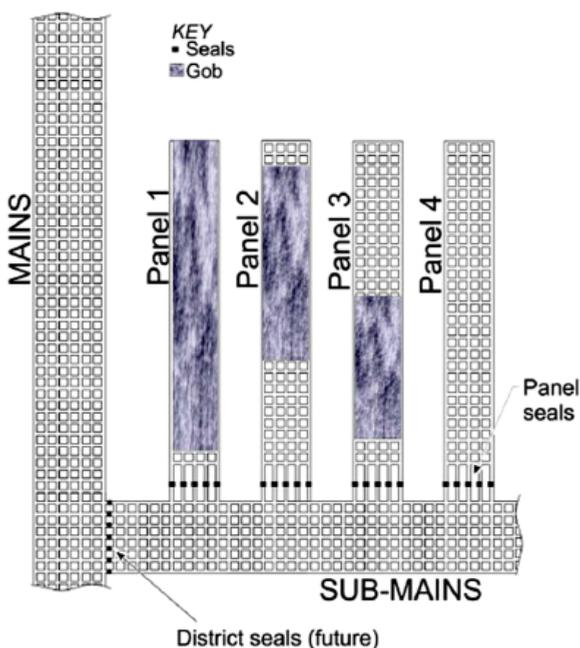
Typical layout of room and pillar retreat mine with seal locations shown (United States, 2007)
